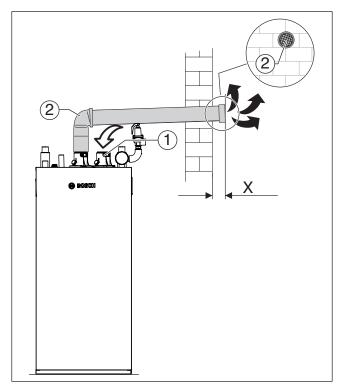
Horizontal venting system (room air only); X≥4" (102 mm)
